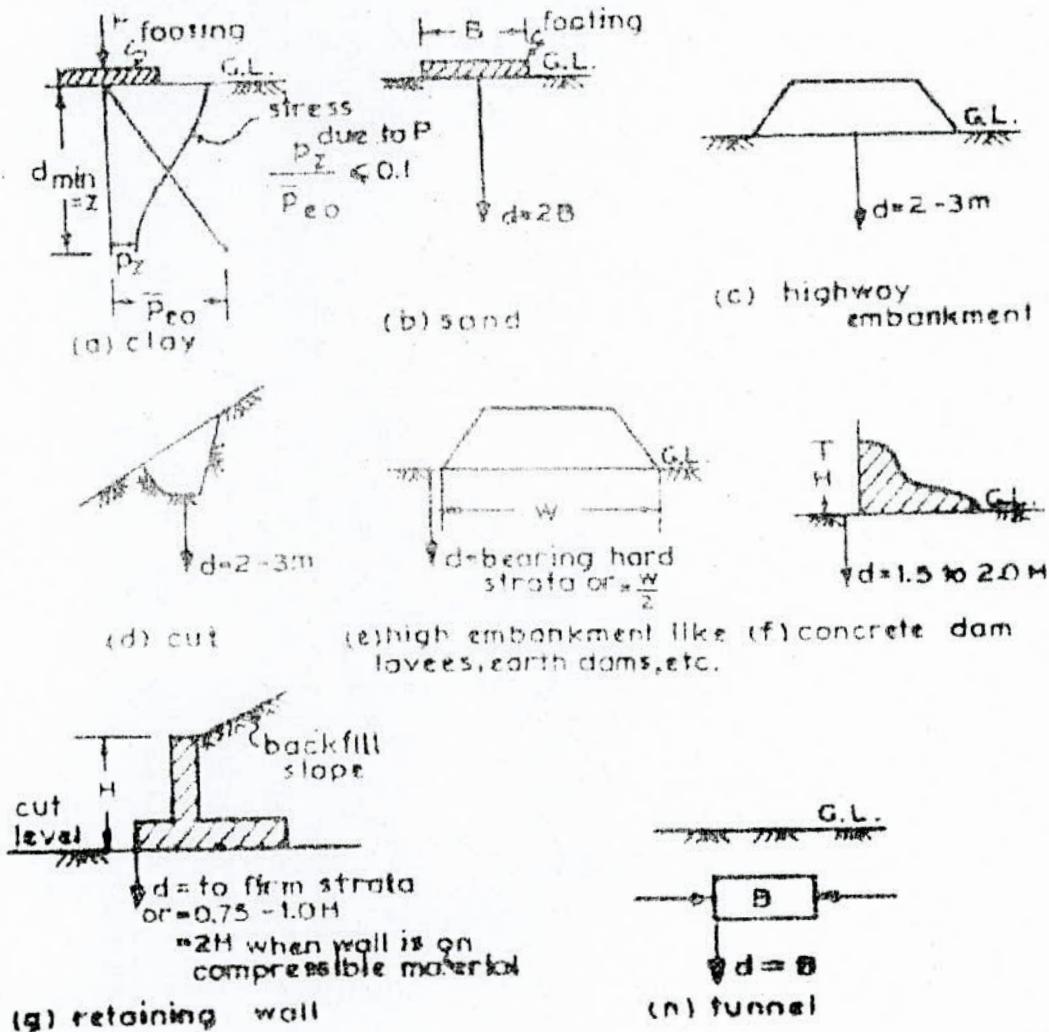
Depth of exploratory borings: (a) footing on clay (b) footing on sand (c) highway embankment (d) cut in natural deposit (e) high embankment like levees, earth dam etc. (f) concrete dams weirs, etc. (g) retaining wall (h) tunnel.
